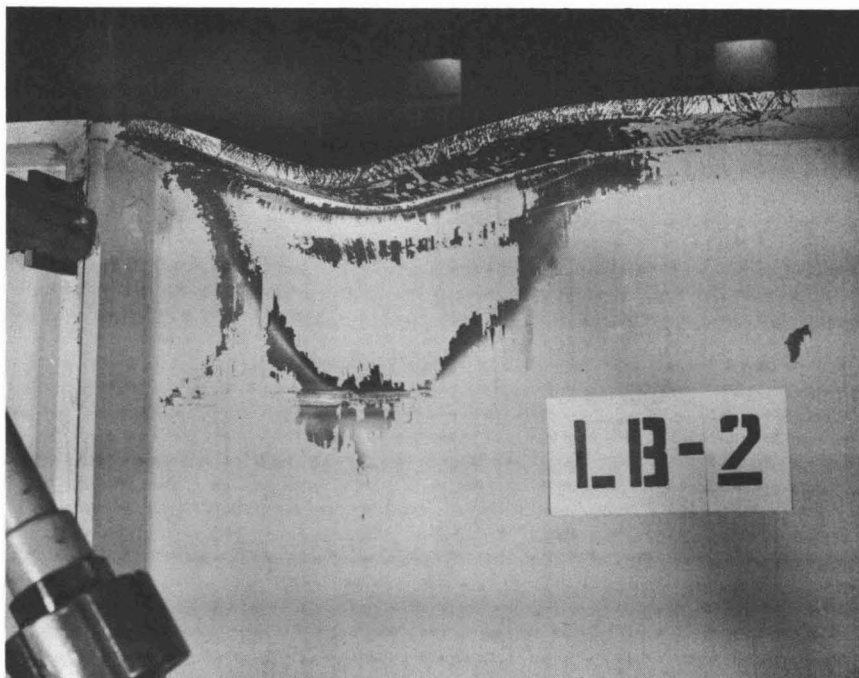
Vertical Buckle, Far Side (Specimen LB2)
